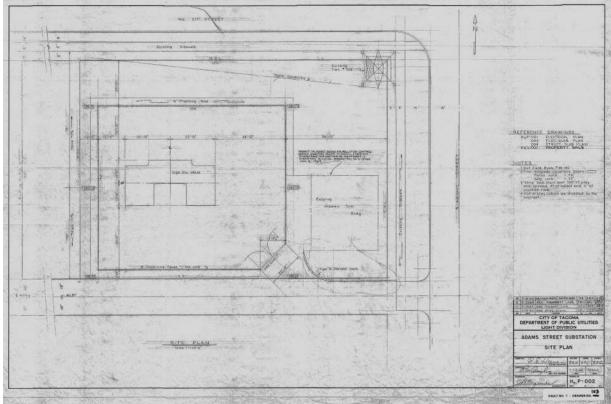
Adams St. Substation, site plan, 1968. Courtesy of Tacoma Power.
